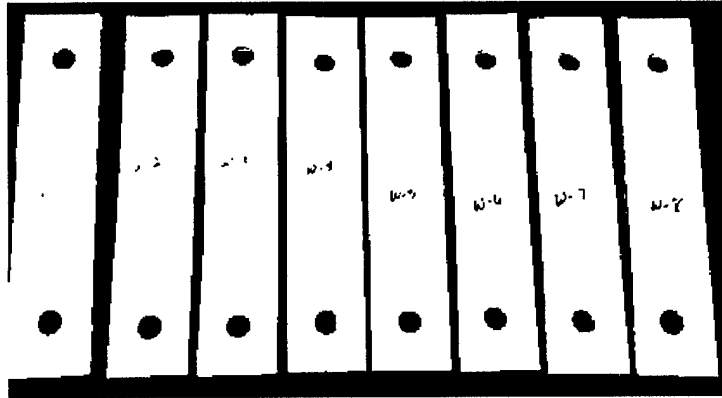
FRP W-beam test coupons for 19.05-mm (0.75-in.) bolt pull-out tests.
